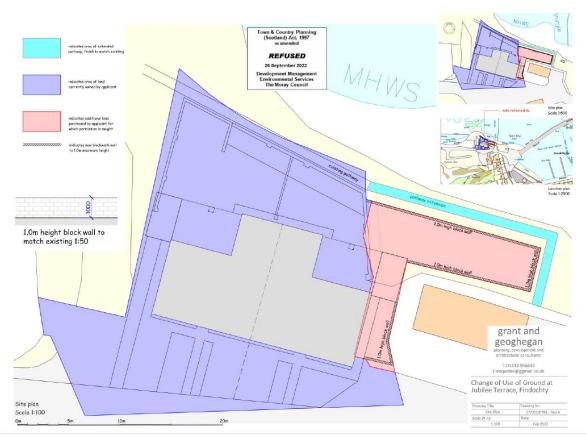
Site Layout Plan, refused by the Moray Council on the 26th of September 2022 under reference 22/00327/APP
